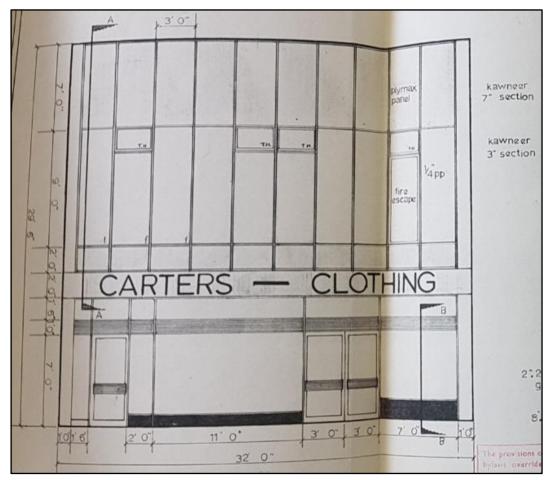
Detail from 1973 plan, showing the street façade of Carter's Building (V. Jackson, 1973).
